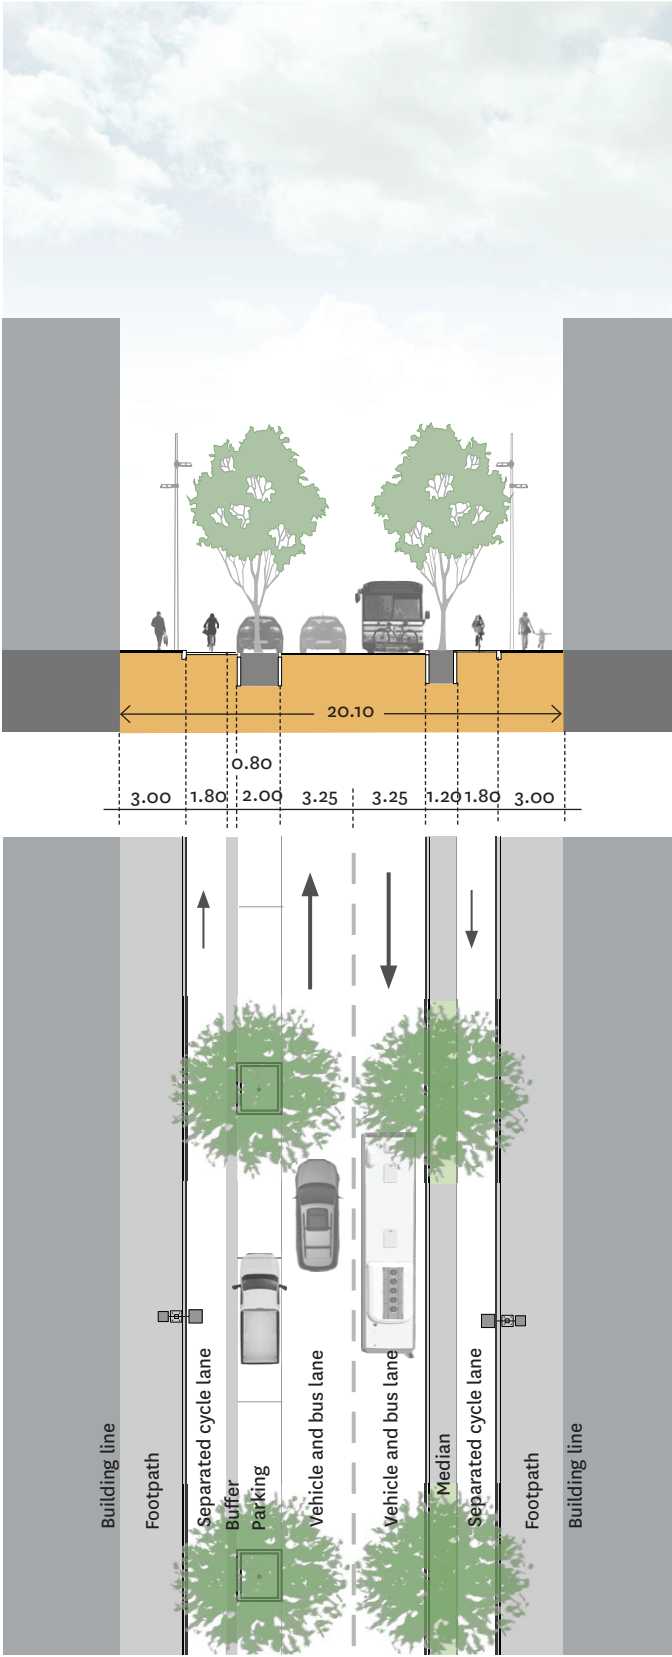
Colombo Street (north), Salisbury Street and Ferry Road
